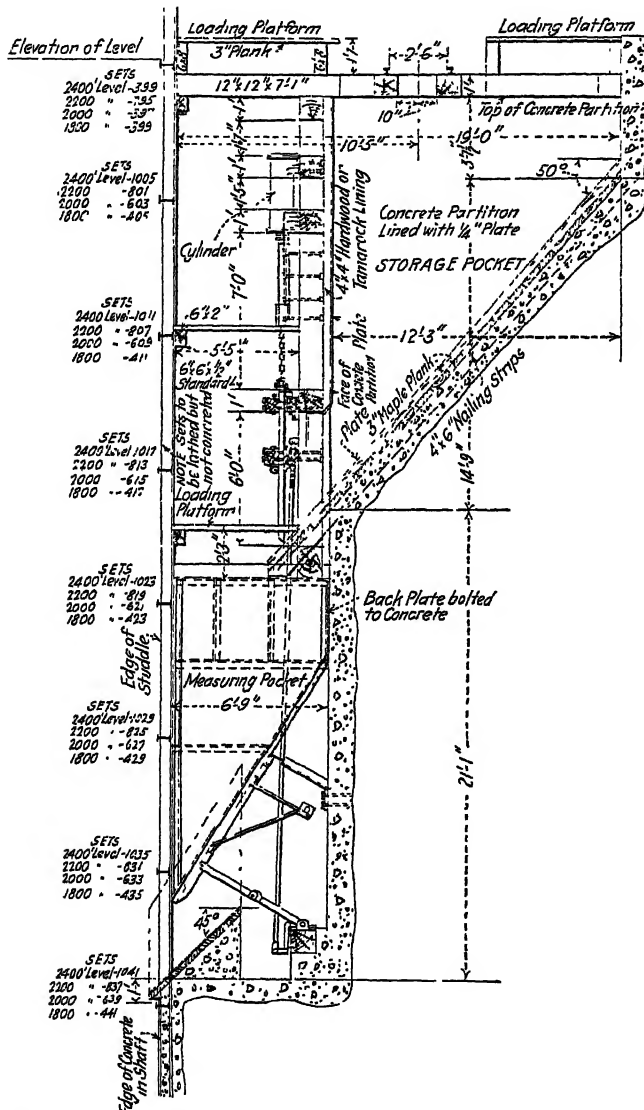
ARRANGEMENT OF LOADING AND DISCHARGING POCKETS.
